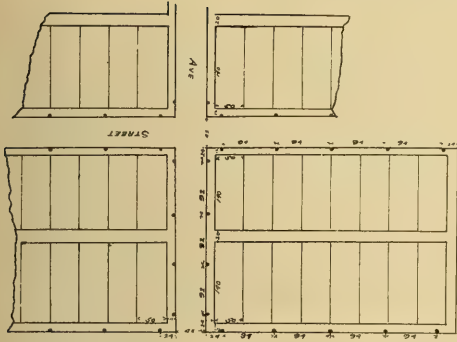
TYPICAL ARRANGEMENT OF STANDARDS ON STREETS AND CORNERS.
